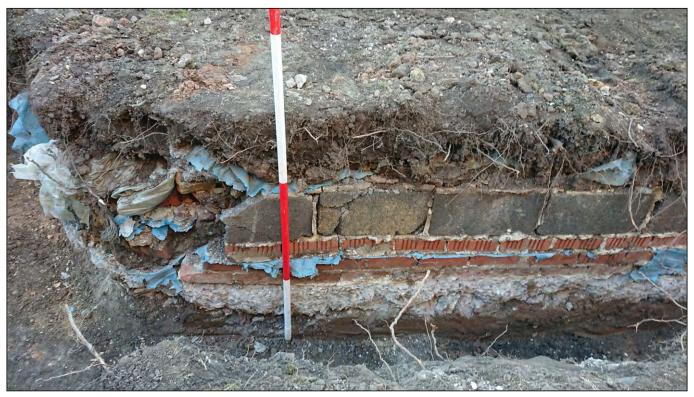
Foundation trench E-A, north facing section showing details of modern foundation, possibly a post-1970s garage structure.
